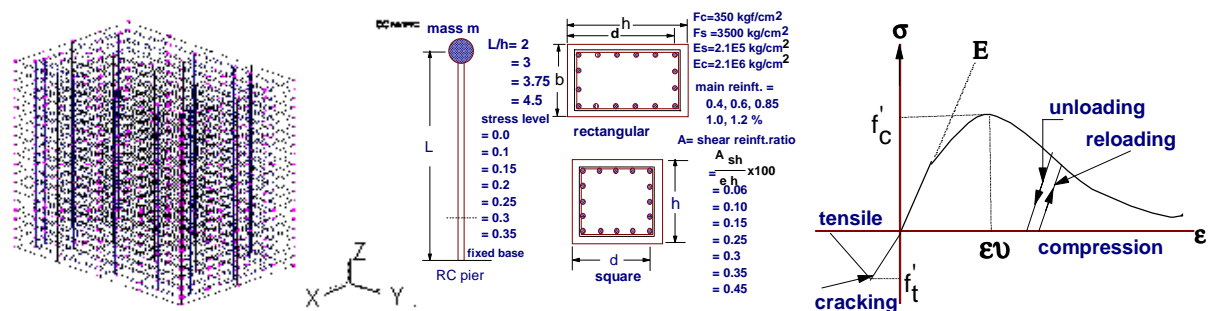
a) 3-D model. b) Parameters of the study. Figure 2: Modeling of concrete in compression.
